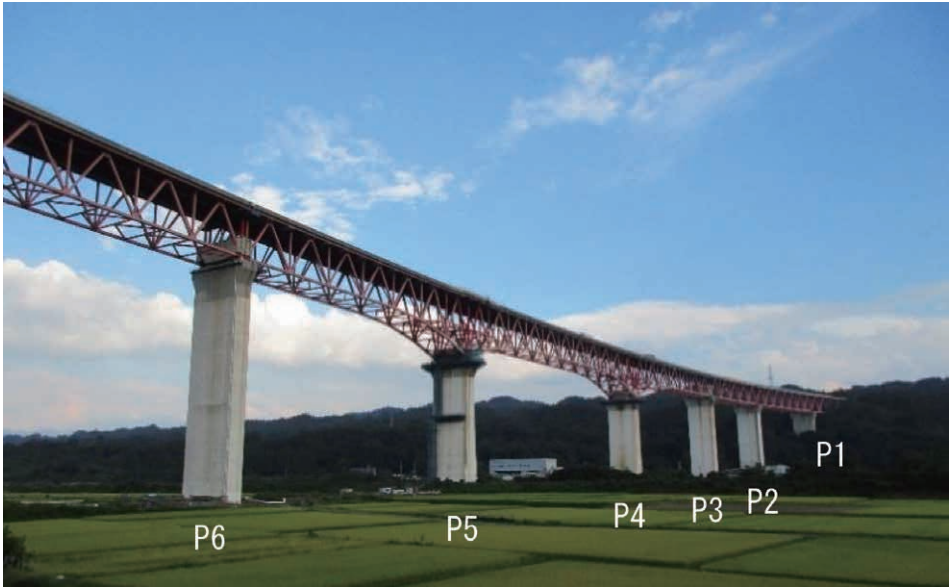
Katashinagawa Bridge, a long truss bridge, on the Kanetsu Expressway
